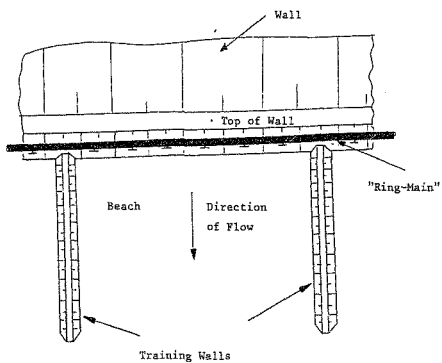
Plan View of Beach Showing Position of Training Walls used to Minimize Formation of Clay Layers
